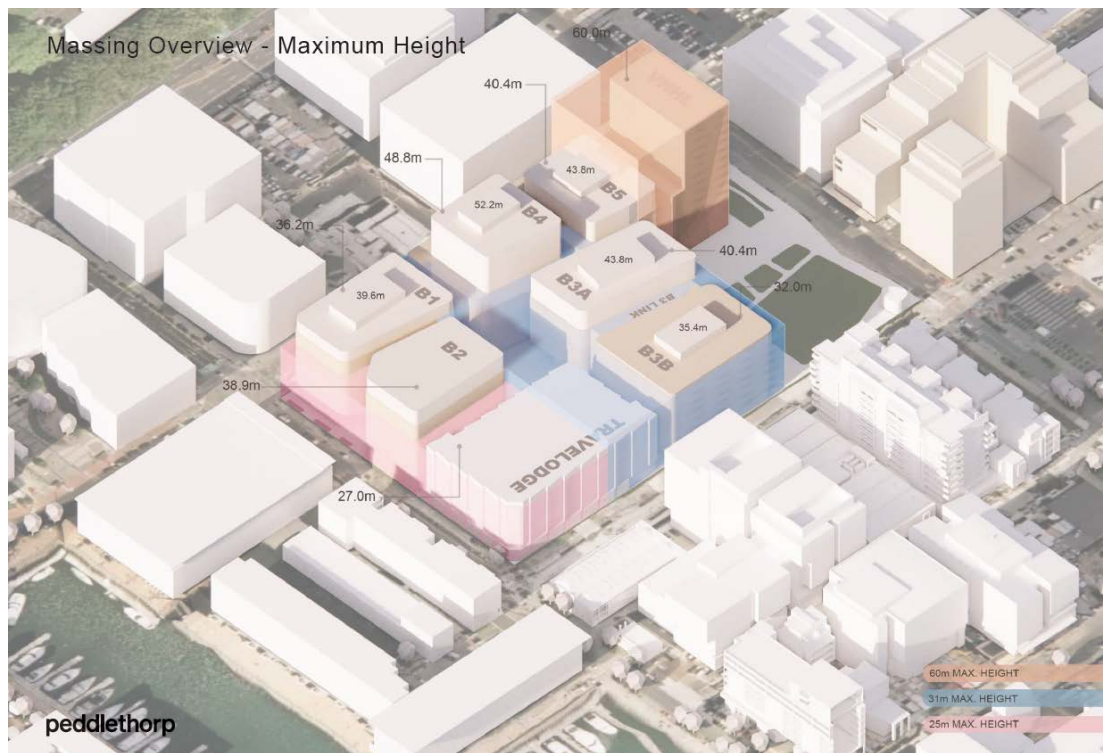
Axonometric view showing the proposed layout of buildings and the varied height profile (source Peddlethorp)
